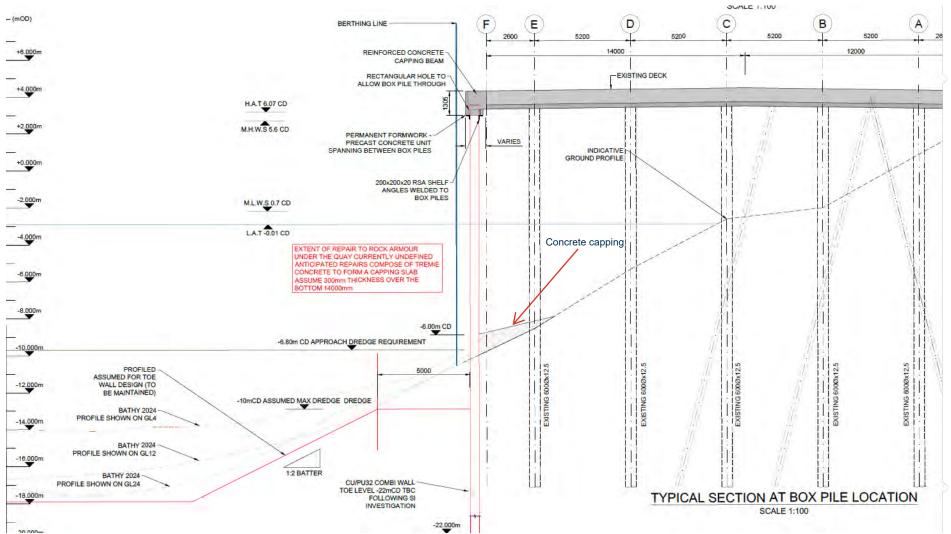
Typical cross section of the improvement works to the PCW (proposed new pile shown in red)
